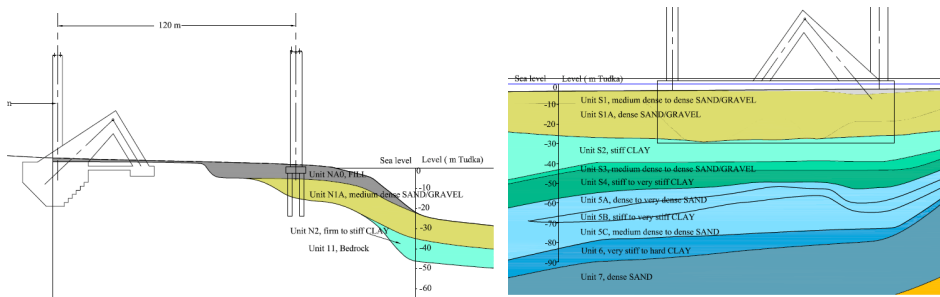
Design profiles; (a) North anchor block; (b) South anchor block
